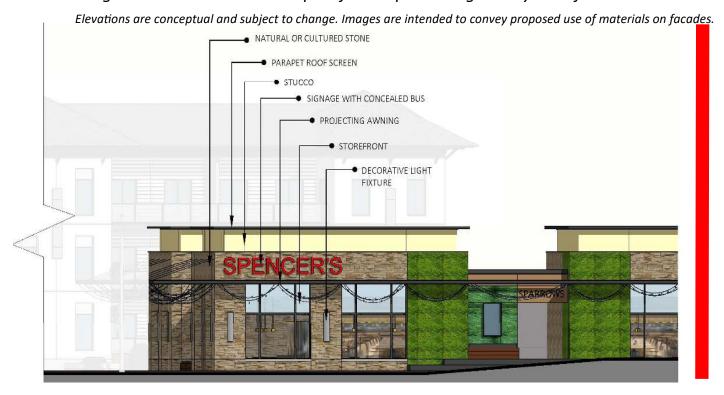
Illustrative Example of Conceptual Multi-Story Facades:
